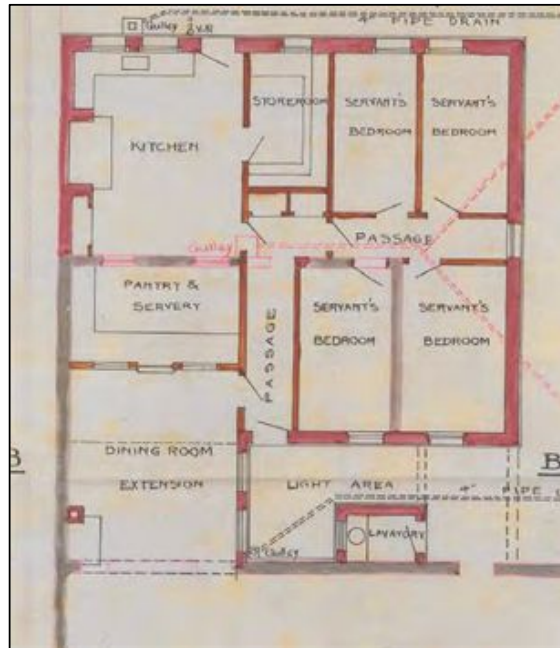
Detail of 1908 renovation plans showing ground floor extension. Note the room in the south-east corner is labelled 'DINING ROOM EXTENSION' (ICC Property File).
